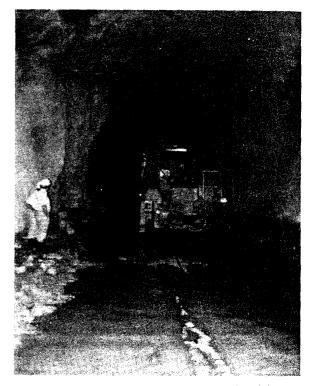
Pilot excavation and lateral stoping holes of the upper section of the pressure tunnel with a diameter of 12 m, in the Saucelle Power Station.
